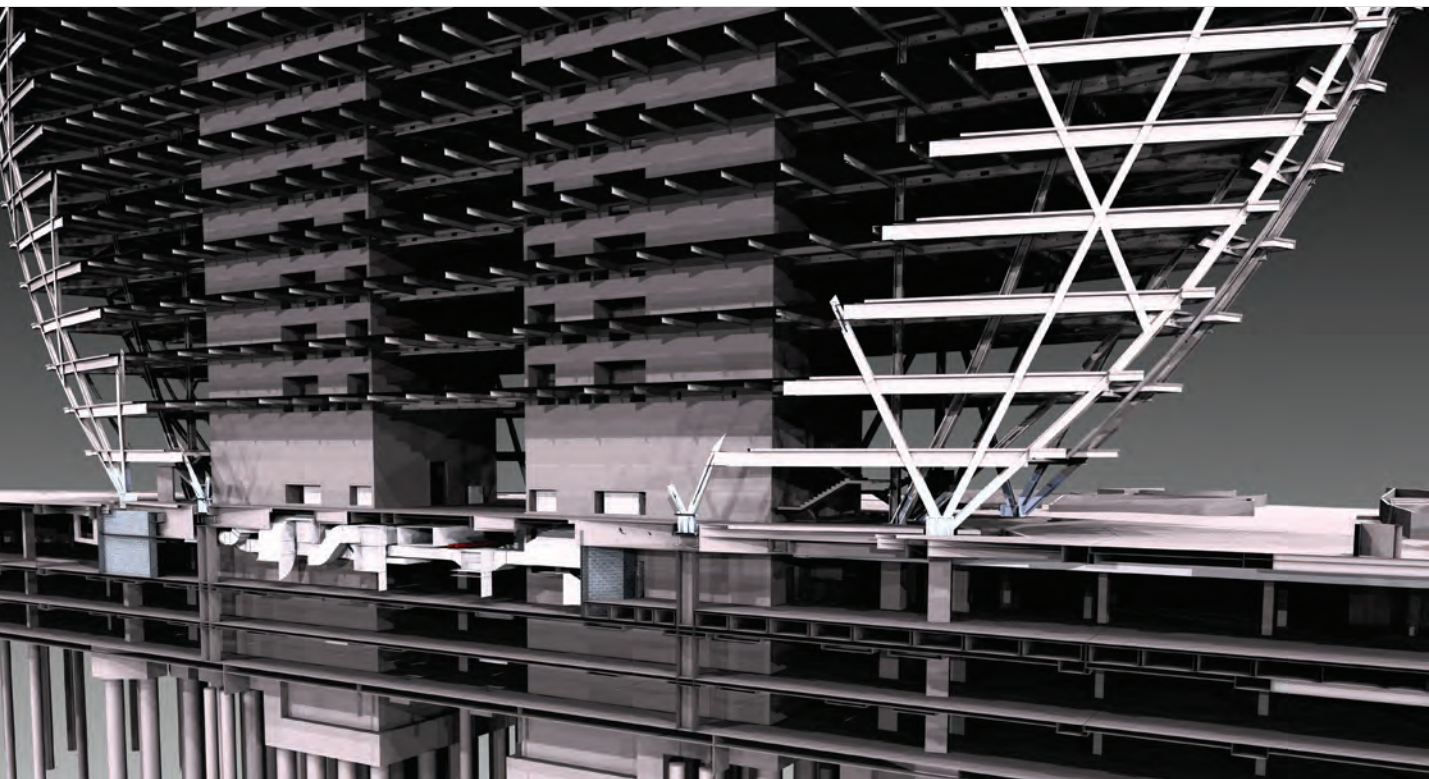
ALDAR Headquarters detailed construction model including steel and concrete detailing by Arup.
